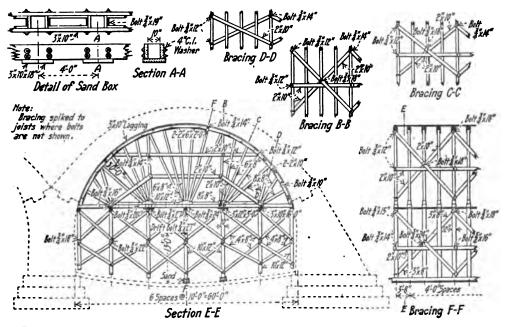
FALSEWORK FOR CONCRETE ARCH BRIDGE, C. & S. RY. AND D. & R. G. R. R.
